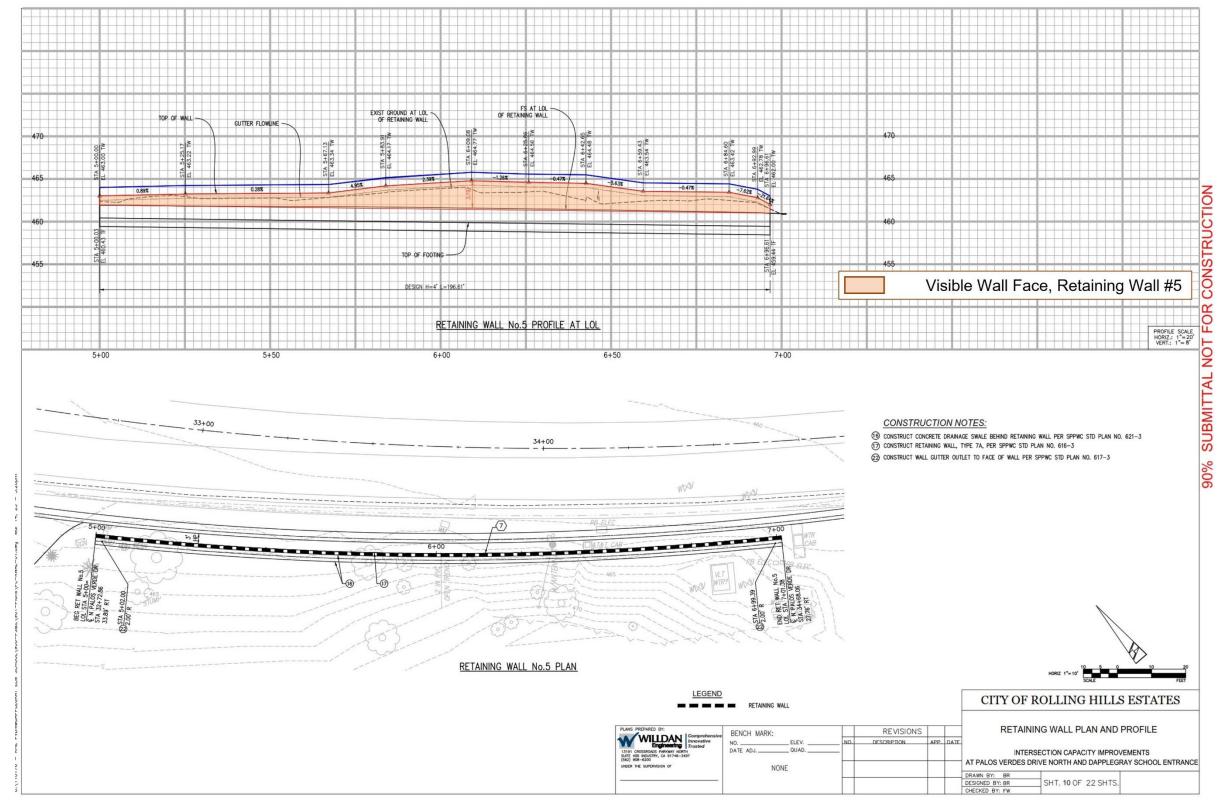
Retaining Wall No. 5 (Schematic Illustration)
